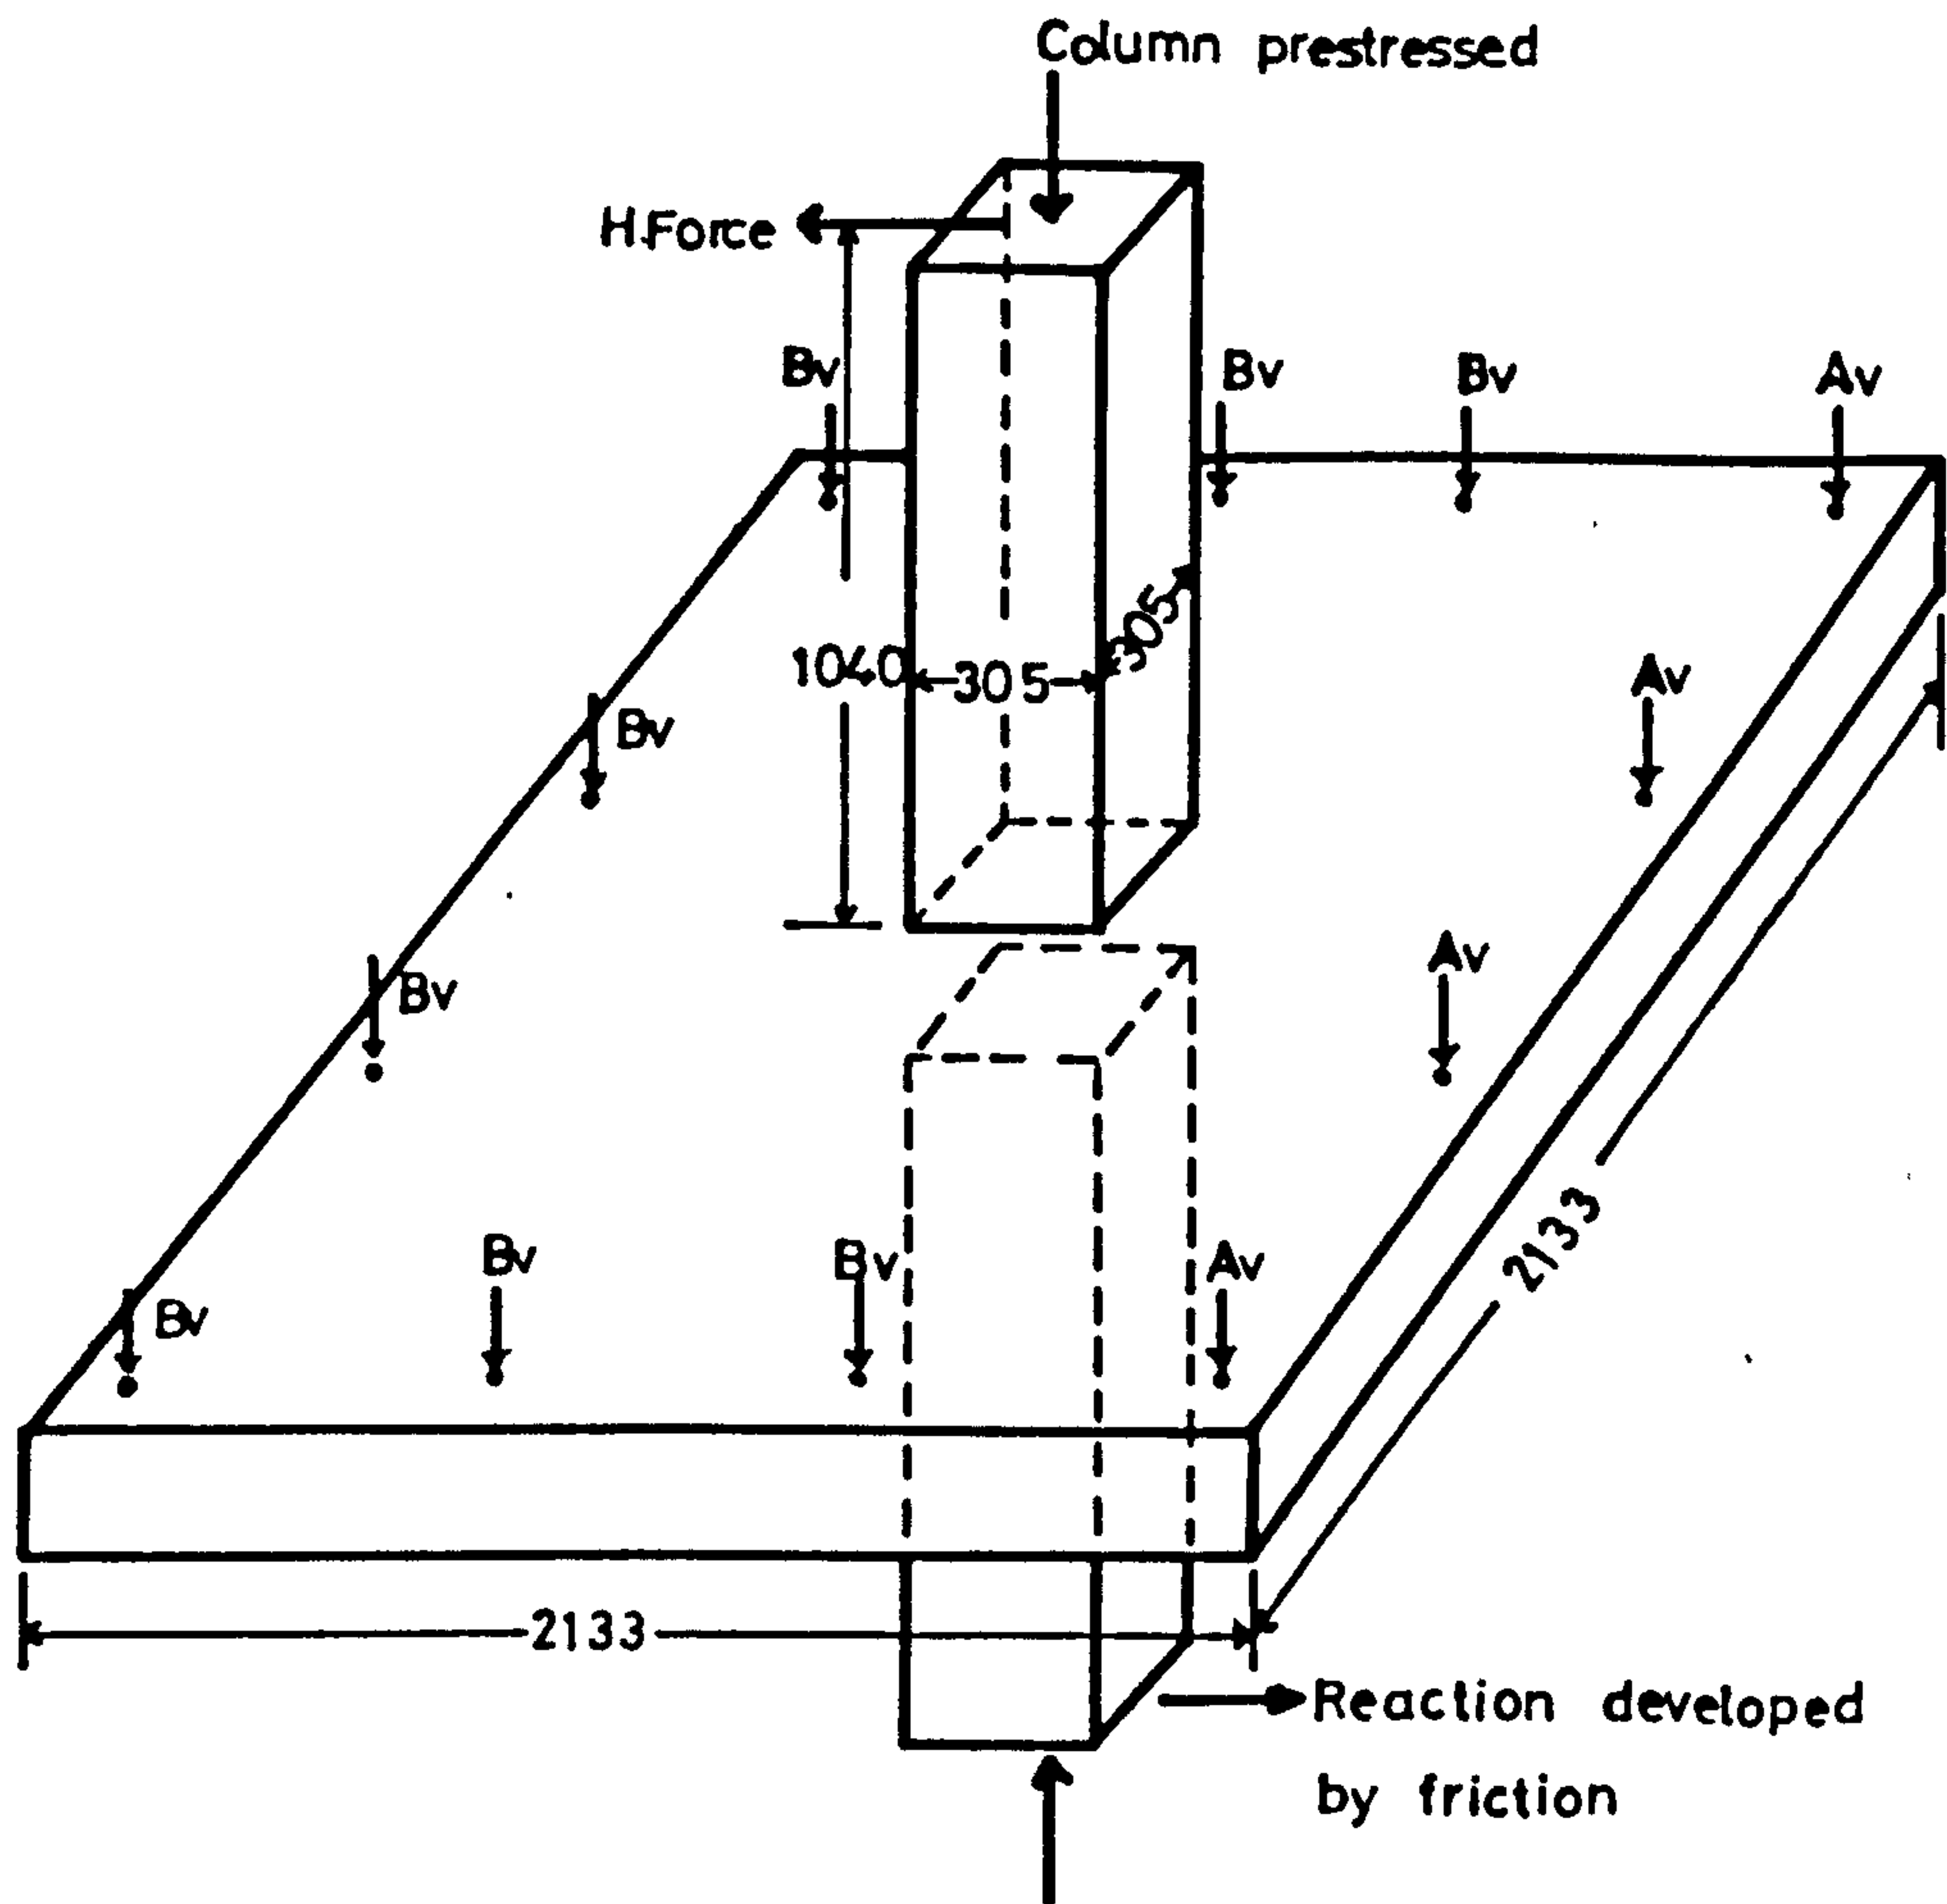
Dimensions and loading arrangement of a typical specimen tested by Hawkins et al.
